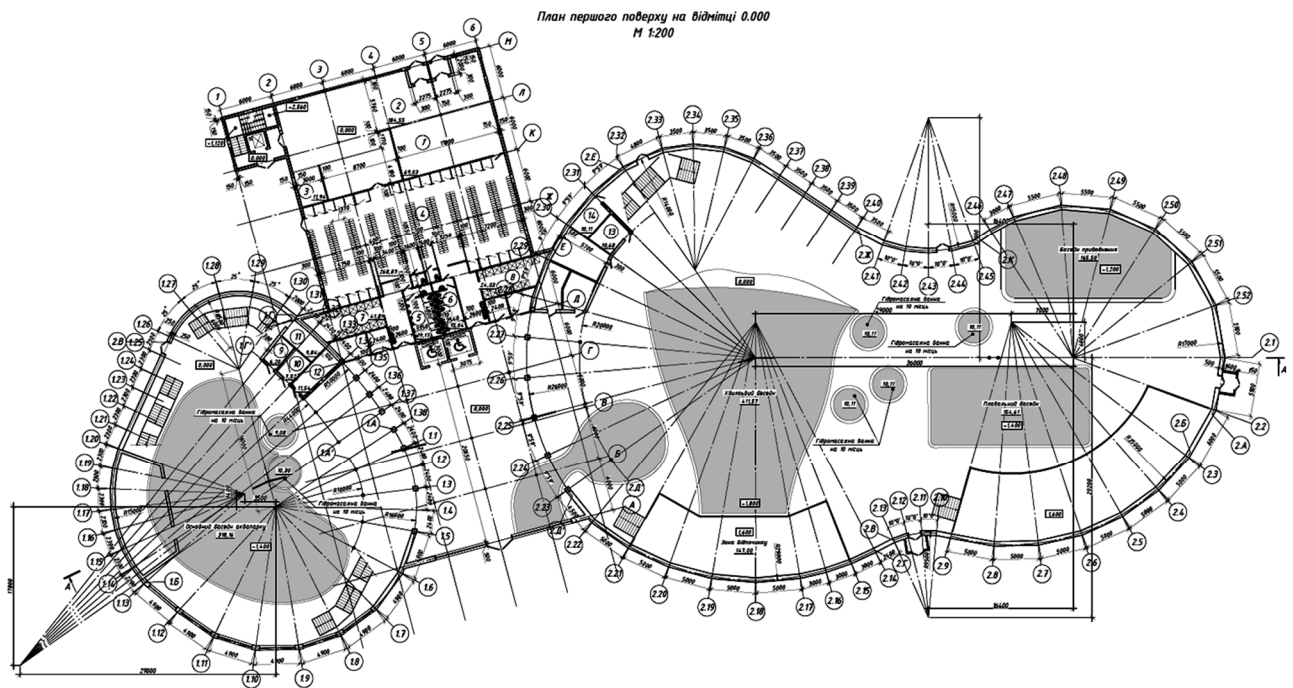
Architectural proposal: plan of the first floor at 0.000
